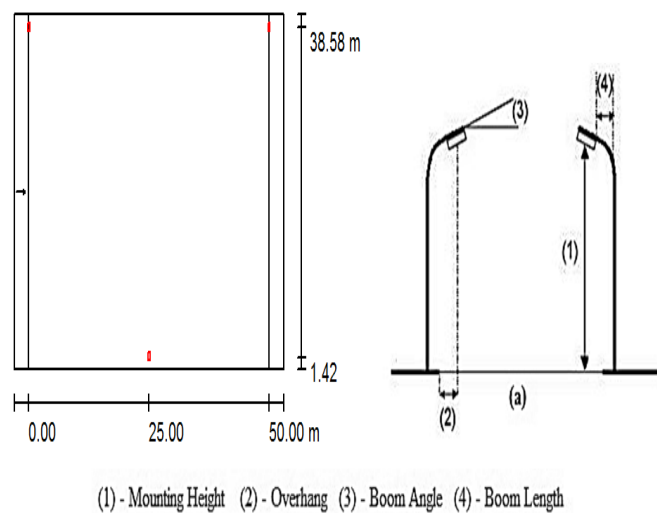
Plan View of Dump Road Lighting Arrangement for the Mine
